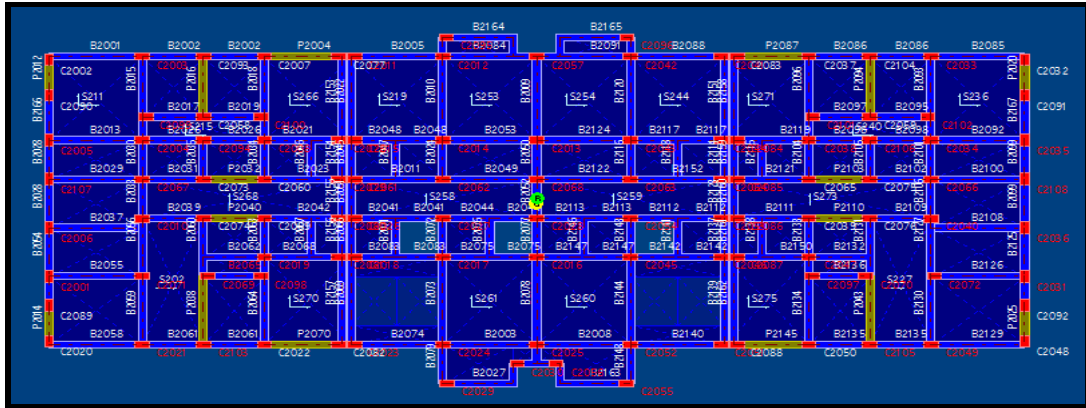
Plan of Twenty Eight Stories and Stiffened Coupled Shear Wall System
